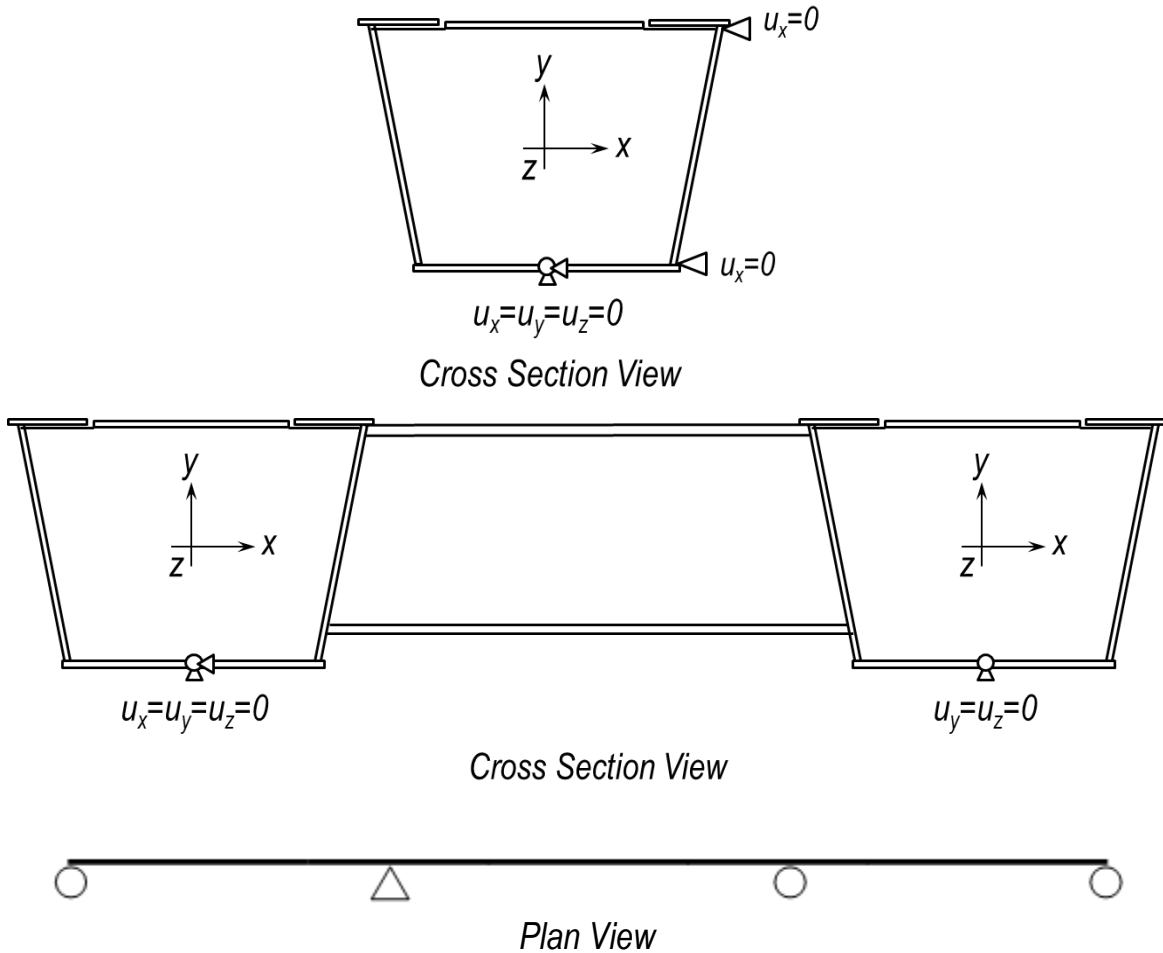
Support Conditions for Single and Multiple Tub Girder Models
